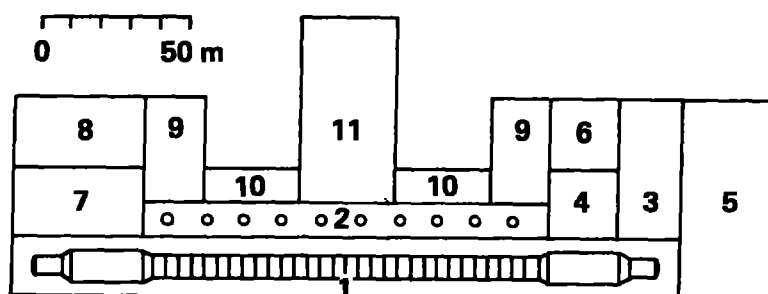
Diagram of plant arrangement: (1) Reactor building, (2) steam generator building, (3) tritium processing building, (4) molten salt processing building, (5) hot cell, (6) radwaste building, (7) component cooling building, (8) plant auxiliary building, (9) power supply building, (10) cryogenics building, and (11) turbine building.
